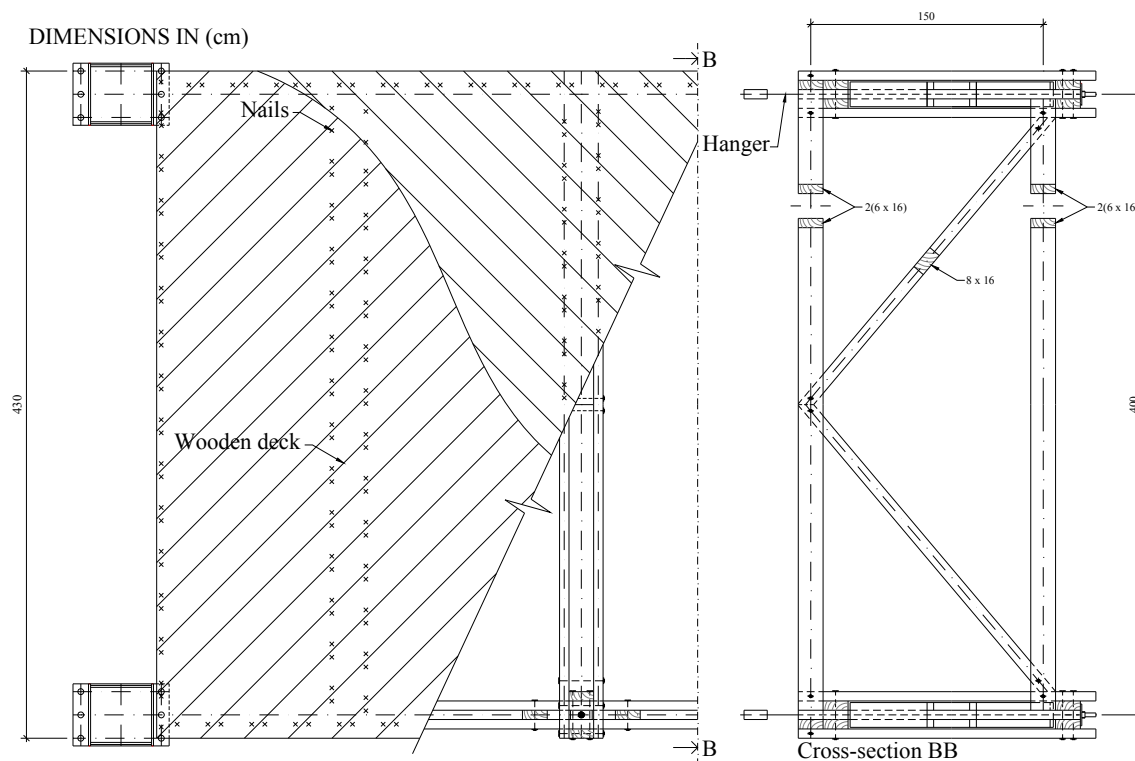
Footbridge structural details – Plan view, Carlito et al. (1993)
